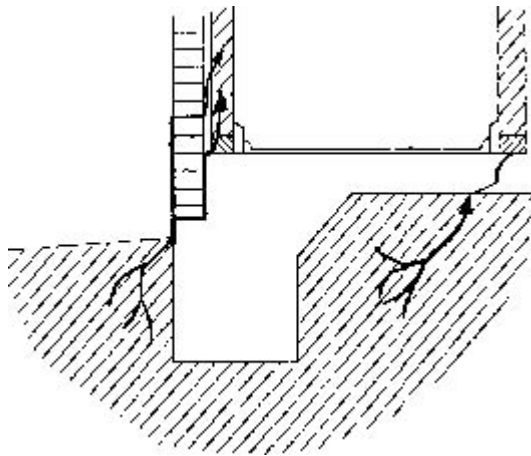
A monolithic slab foundation and a brick veneer with arrows indicating potential termite entry points into the structure (illustration courtesy of MSUE)
